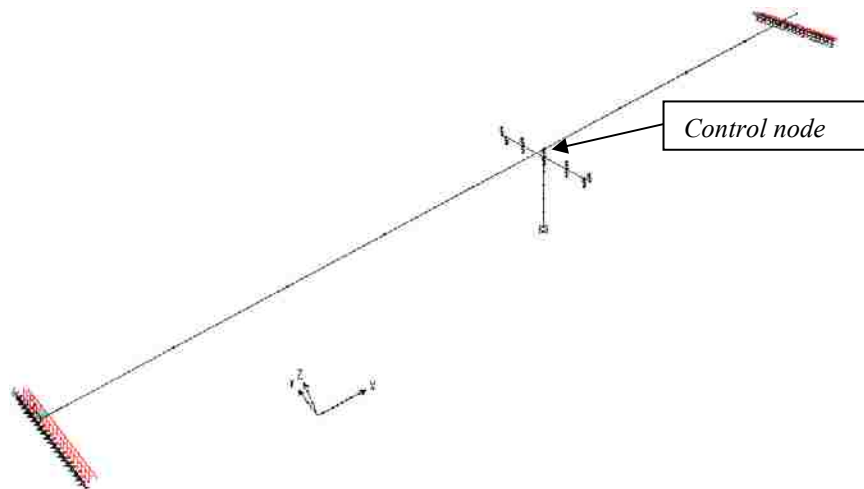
Bridge H-1211 - Structural model for both transverse and longitudinal direction
